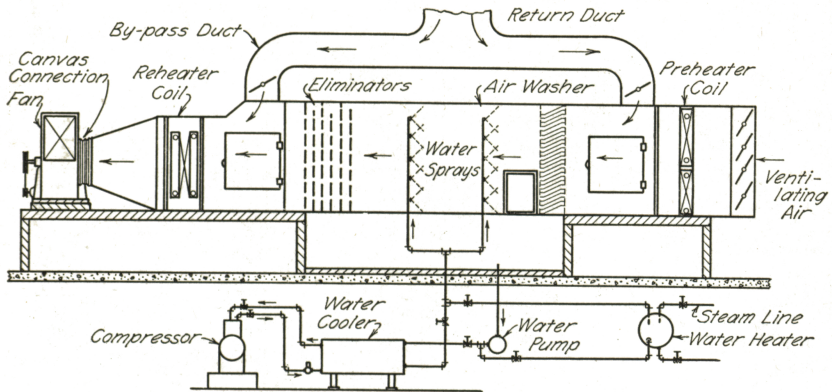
ELEVATION OF TYPICAL CENTRAL PLANT
